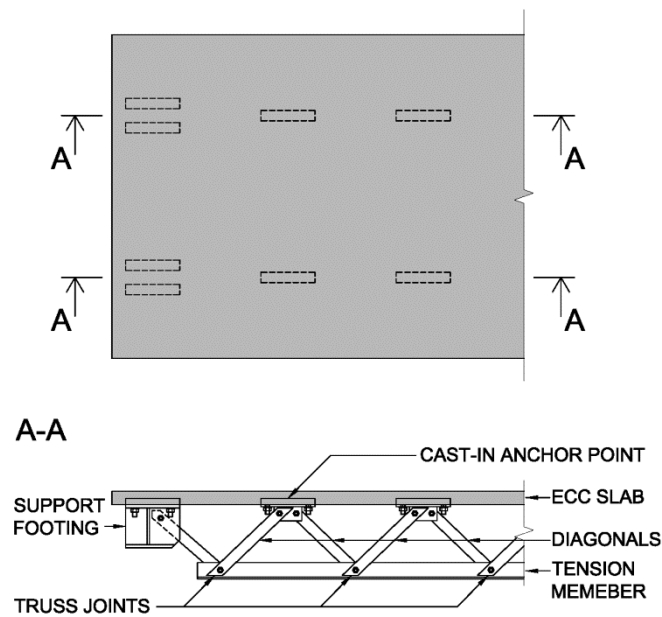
a) Plan over-view of the modular deck, b) longitudinal cross section of truss structure connected to ECC deck panel
